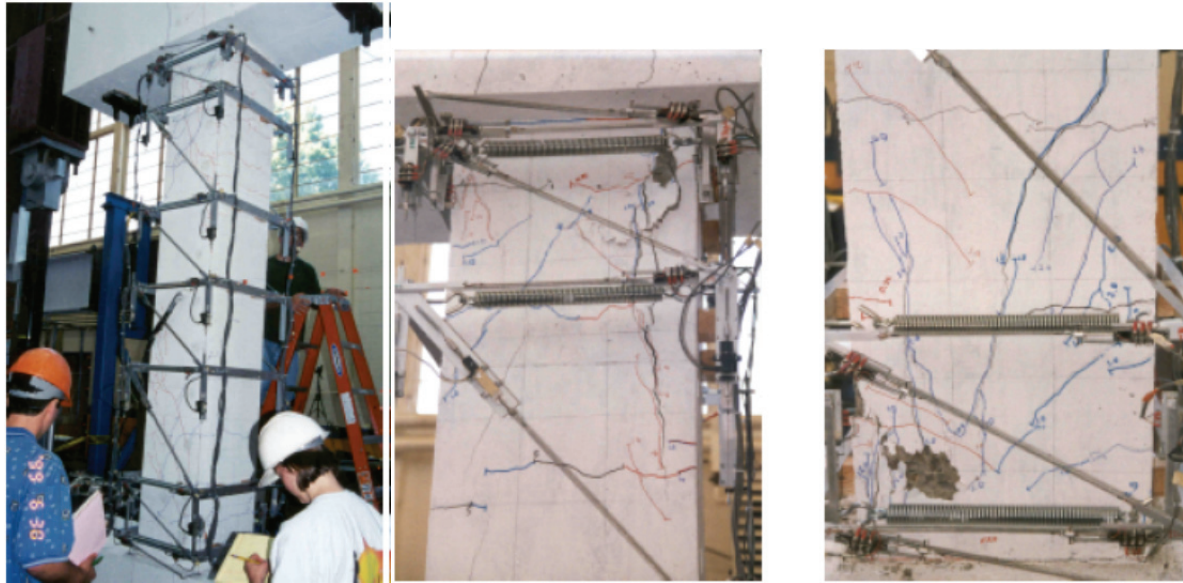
Special moment frame (SMF) sub-assembly following testing to 0.82% story drift and yielding of beam longitudinal reinforcement. Beam, column and joint show cracking that is representative of Damage State 0. Figure 5.3 from Birss et al. (1987).
